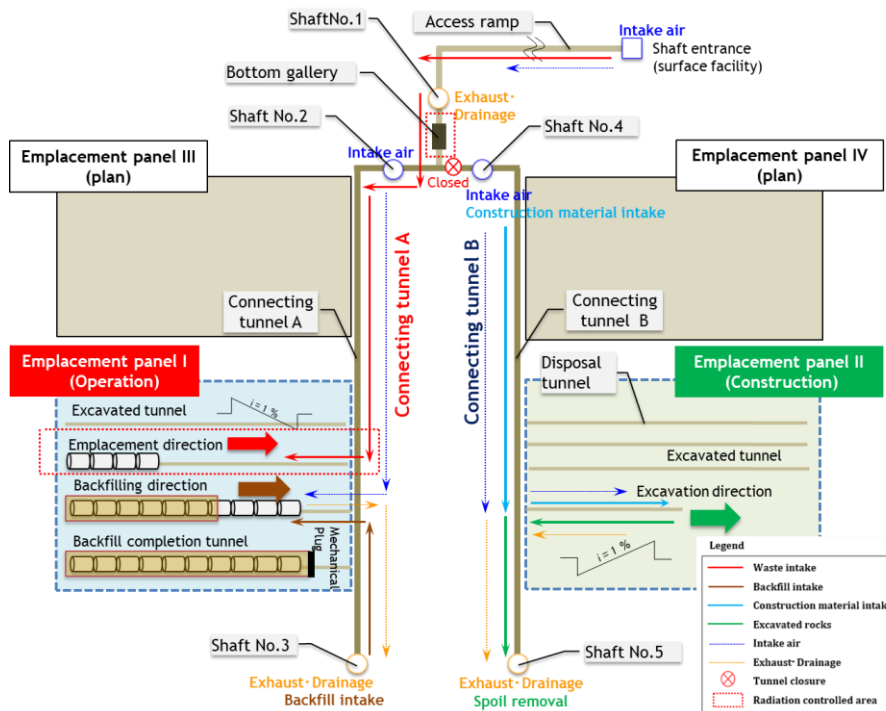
Conceptual sketch of tunnel layout (HLW DET panels)
